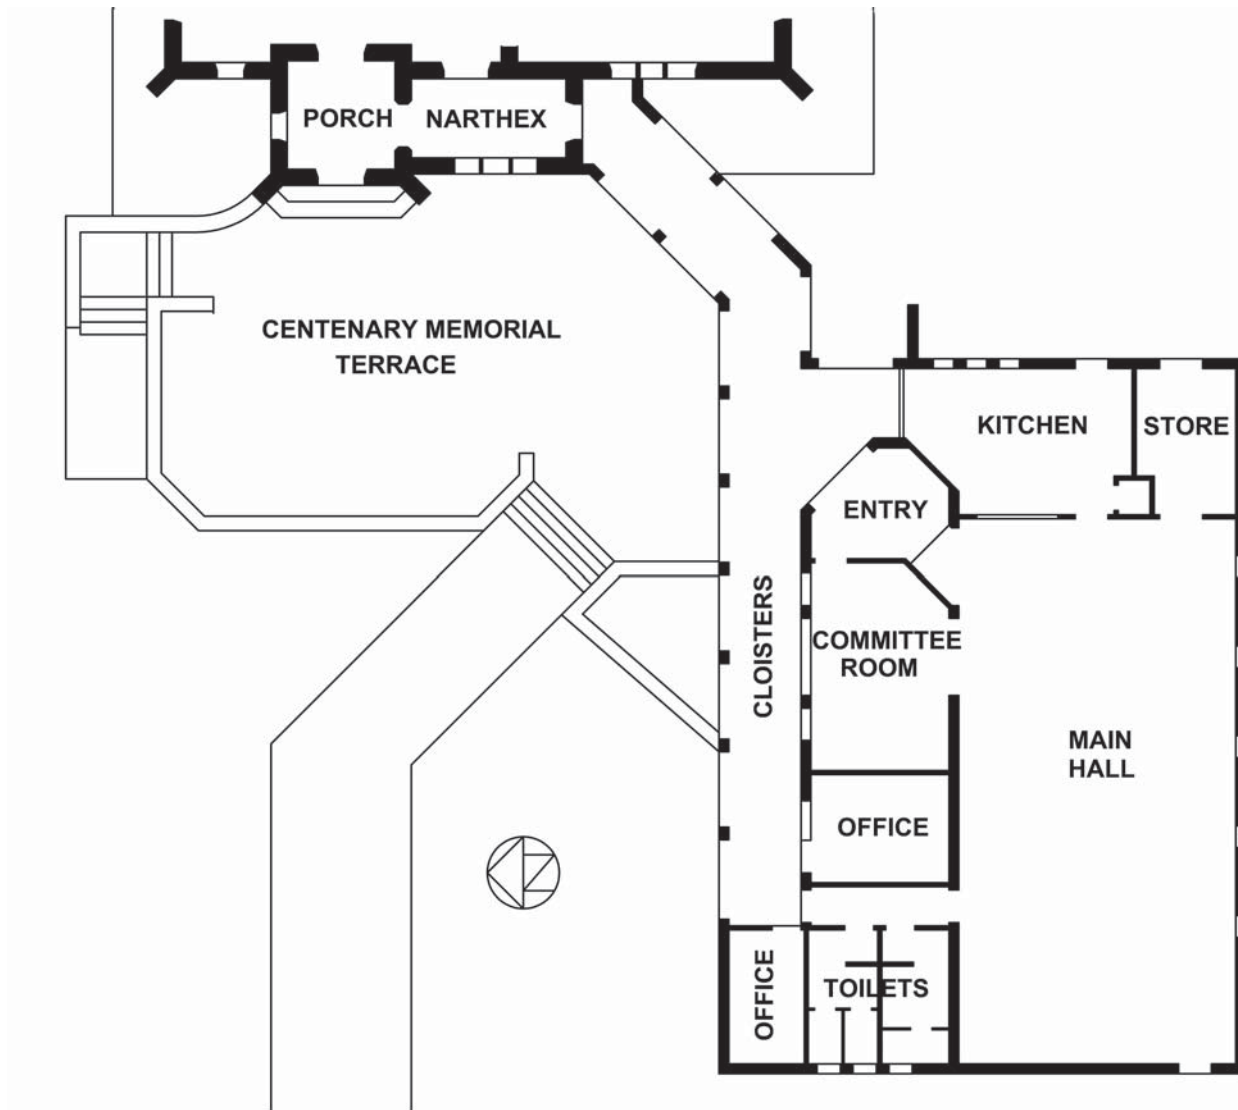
Layout of the new Parish Hall based on plans prepared by Tugwell Tetley Hardy Architects. (Ben Oborn, 2002)
